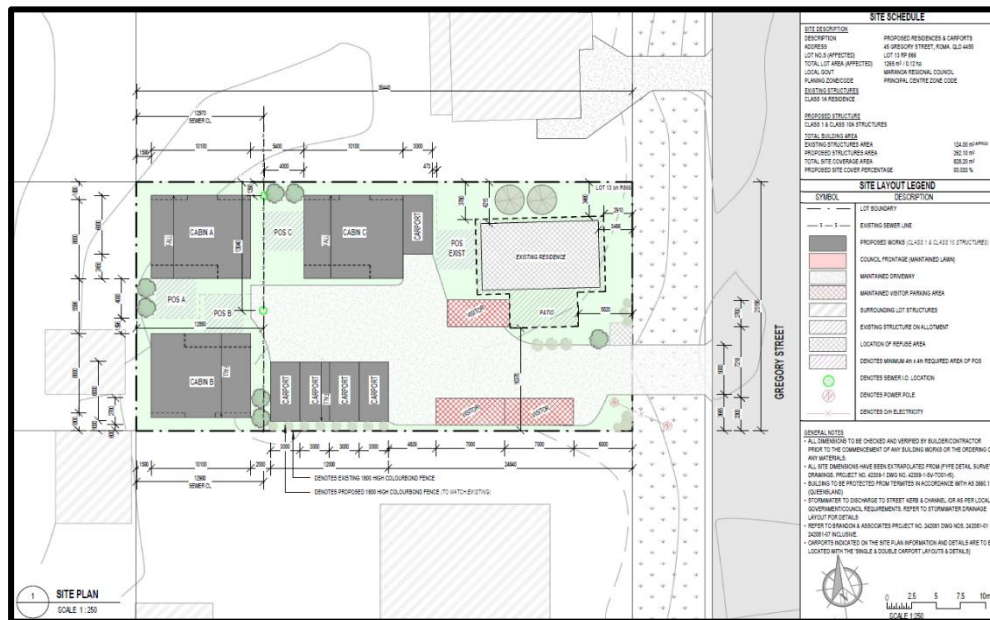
Proposed Site Plan (Source: Brandon & Associates)
